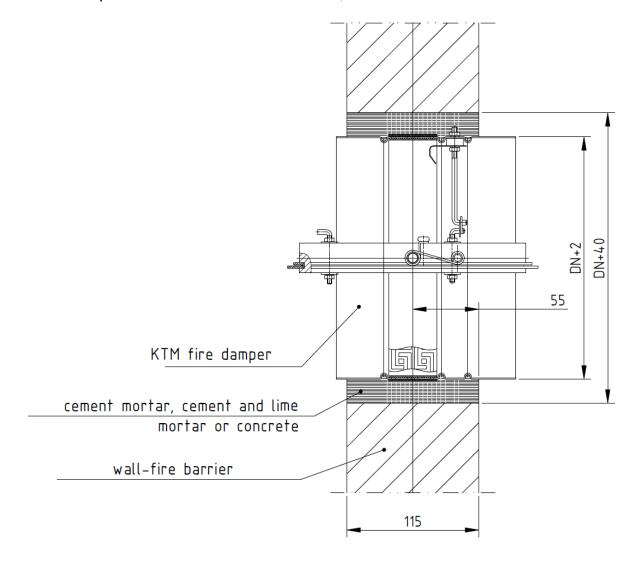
Installation of KTM fire damper (female coupling) in rigid wall barrier
